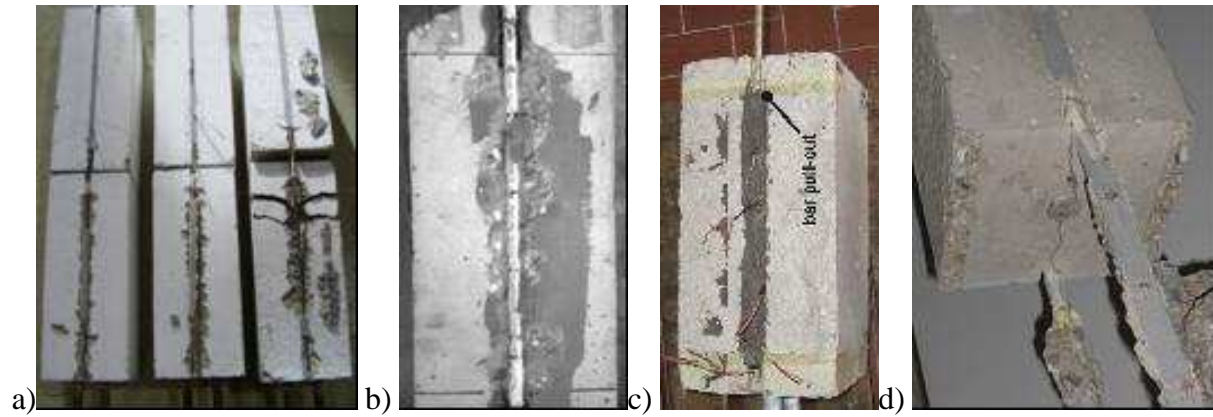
Failure modes: a-b) debonding concrete epoxy interface; c) bar pull out; d) concrete splitting
